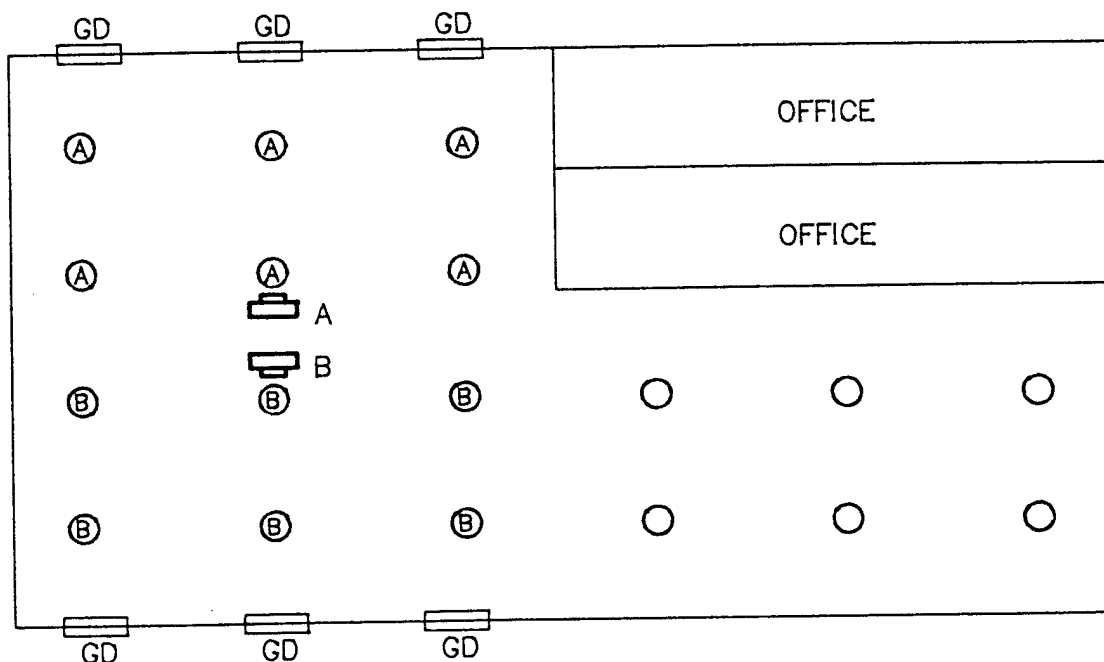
PHOTOCELL CONTROL LAYOUT - BUILDING 5220
